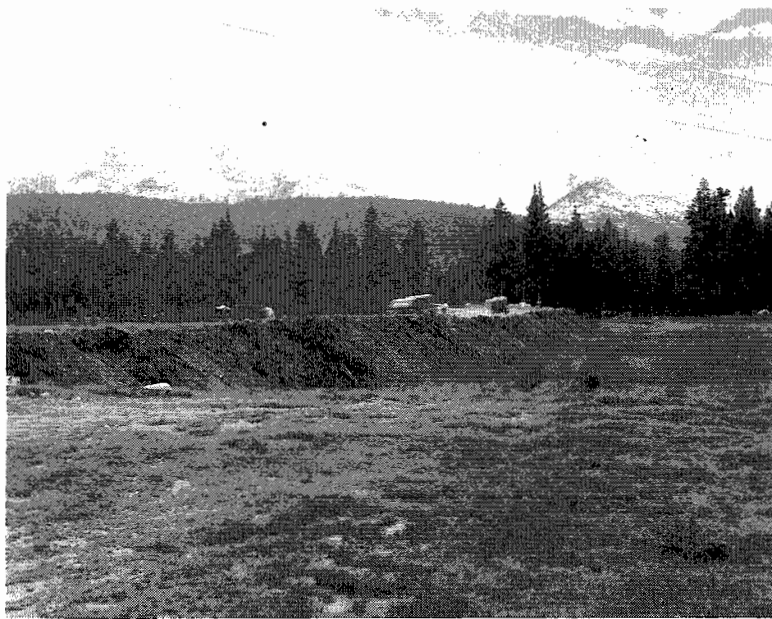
New Tioga Road where it crosses Tuolumne Meadows on a long, high fill.
